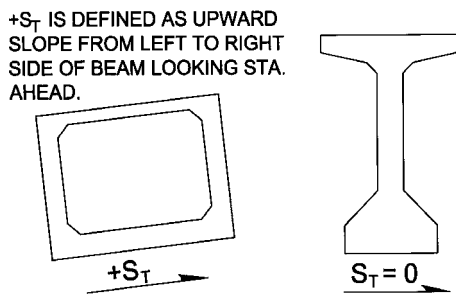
2.3P-1 – Transverse Beam Slope
